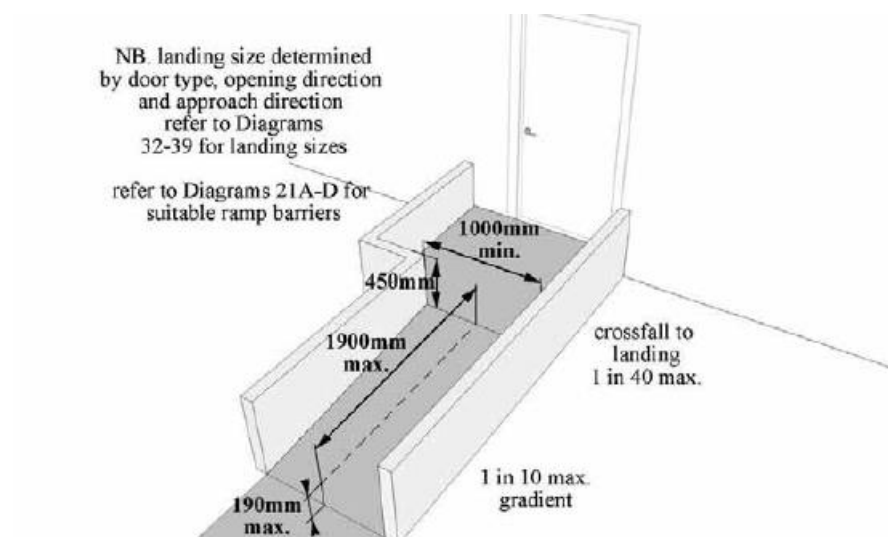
Step Ramp at External Doorway – Front Approach
